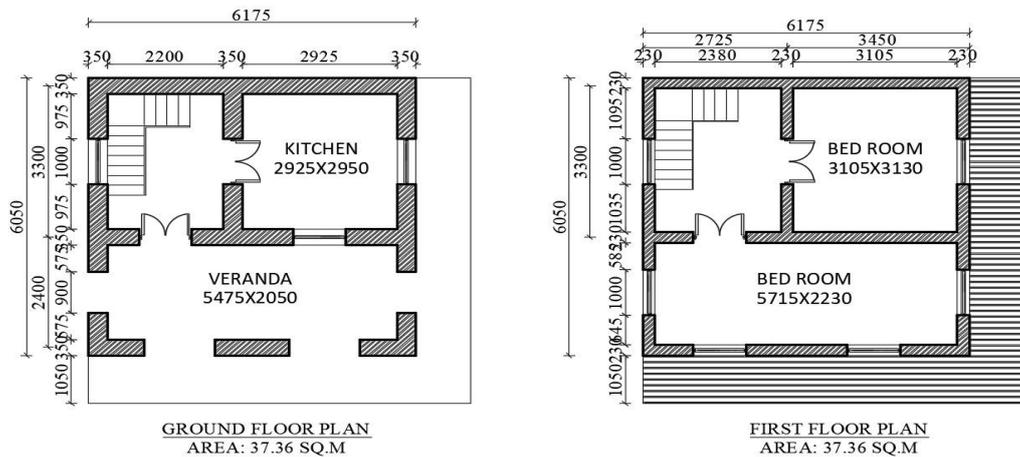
Ground floor and first floor plan BMC 2.2 LB
